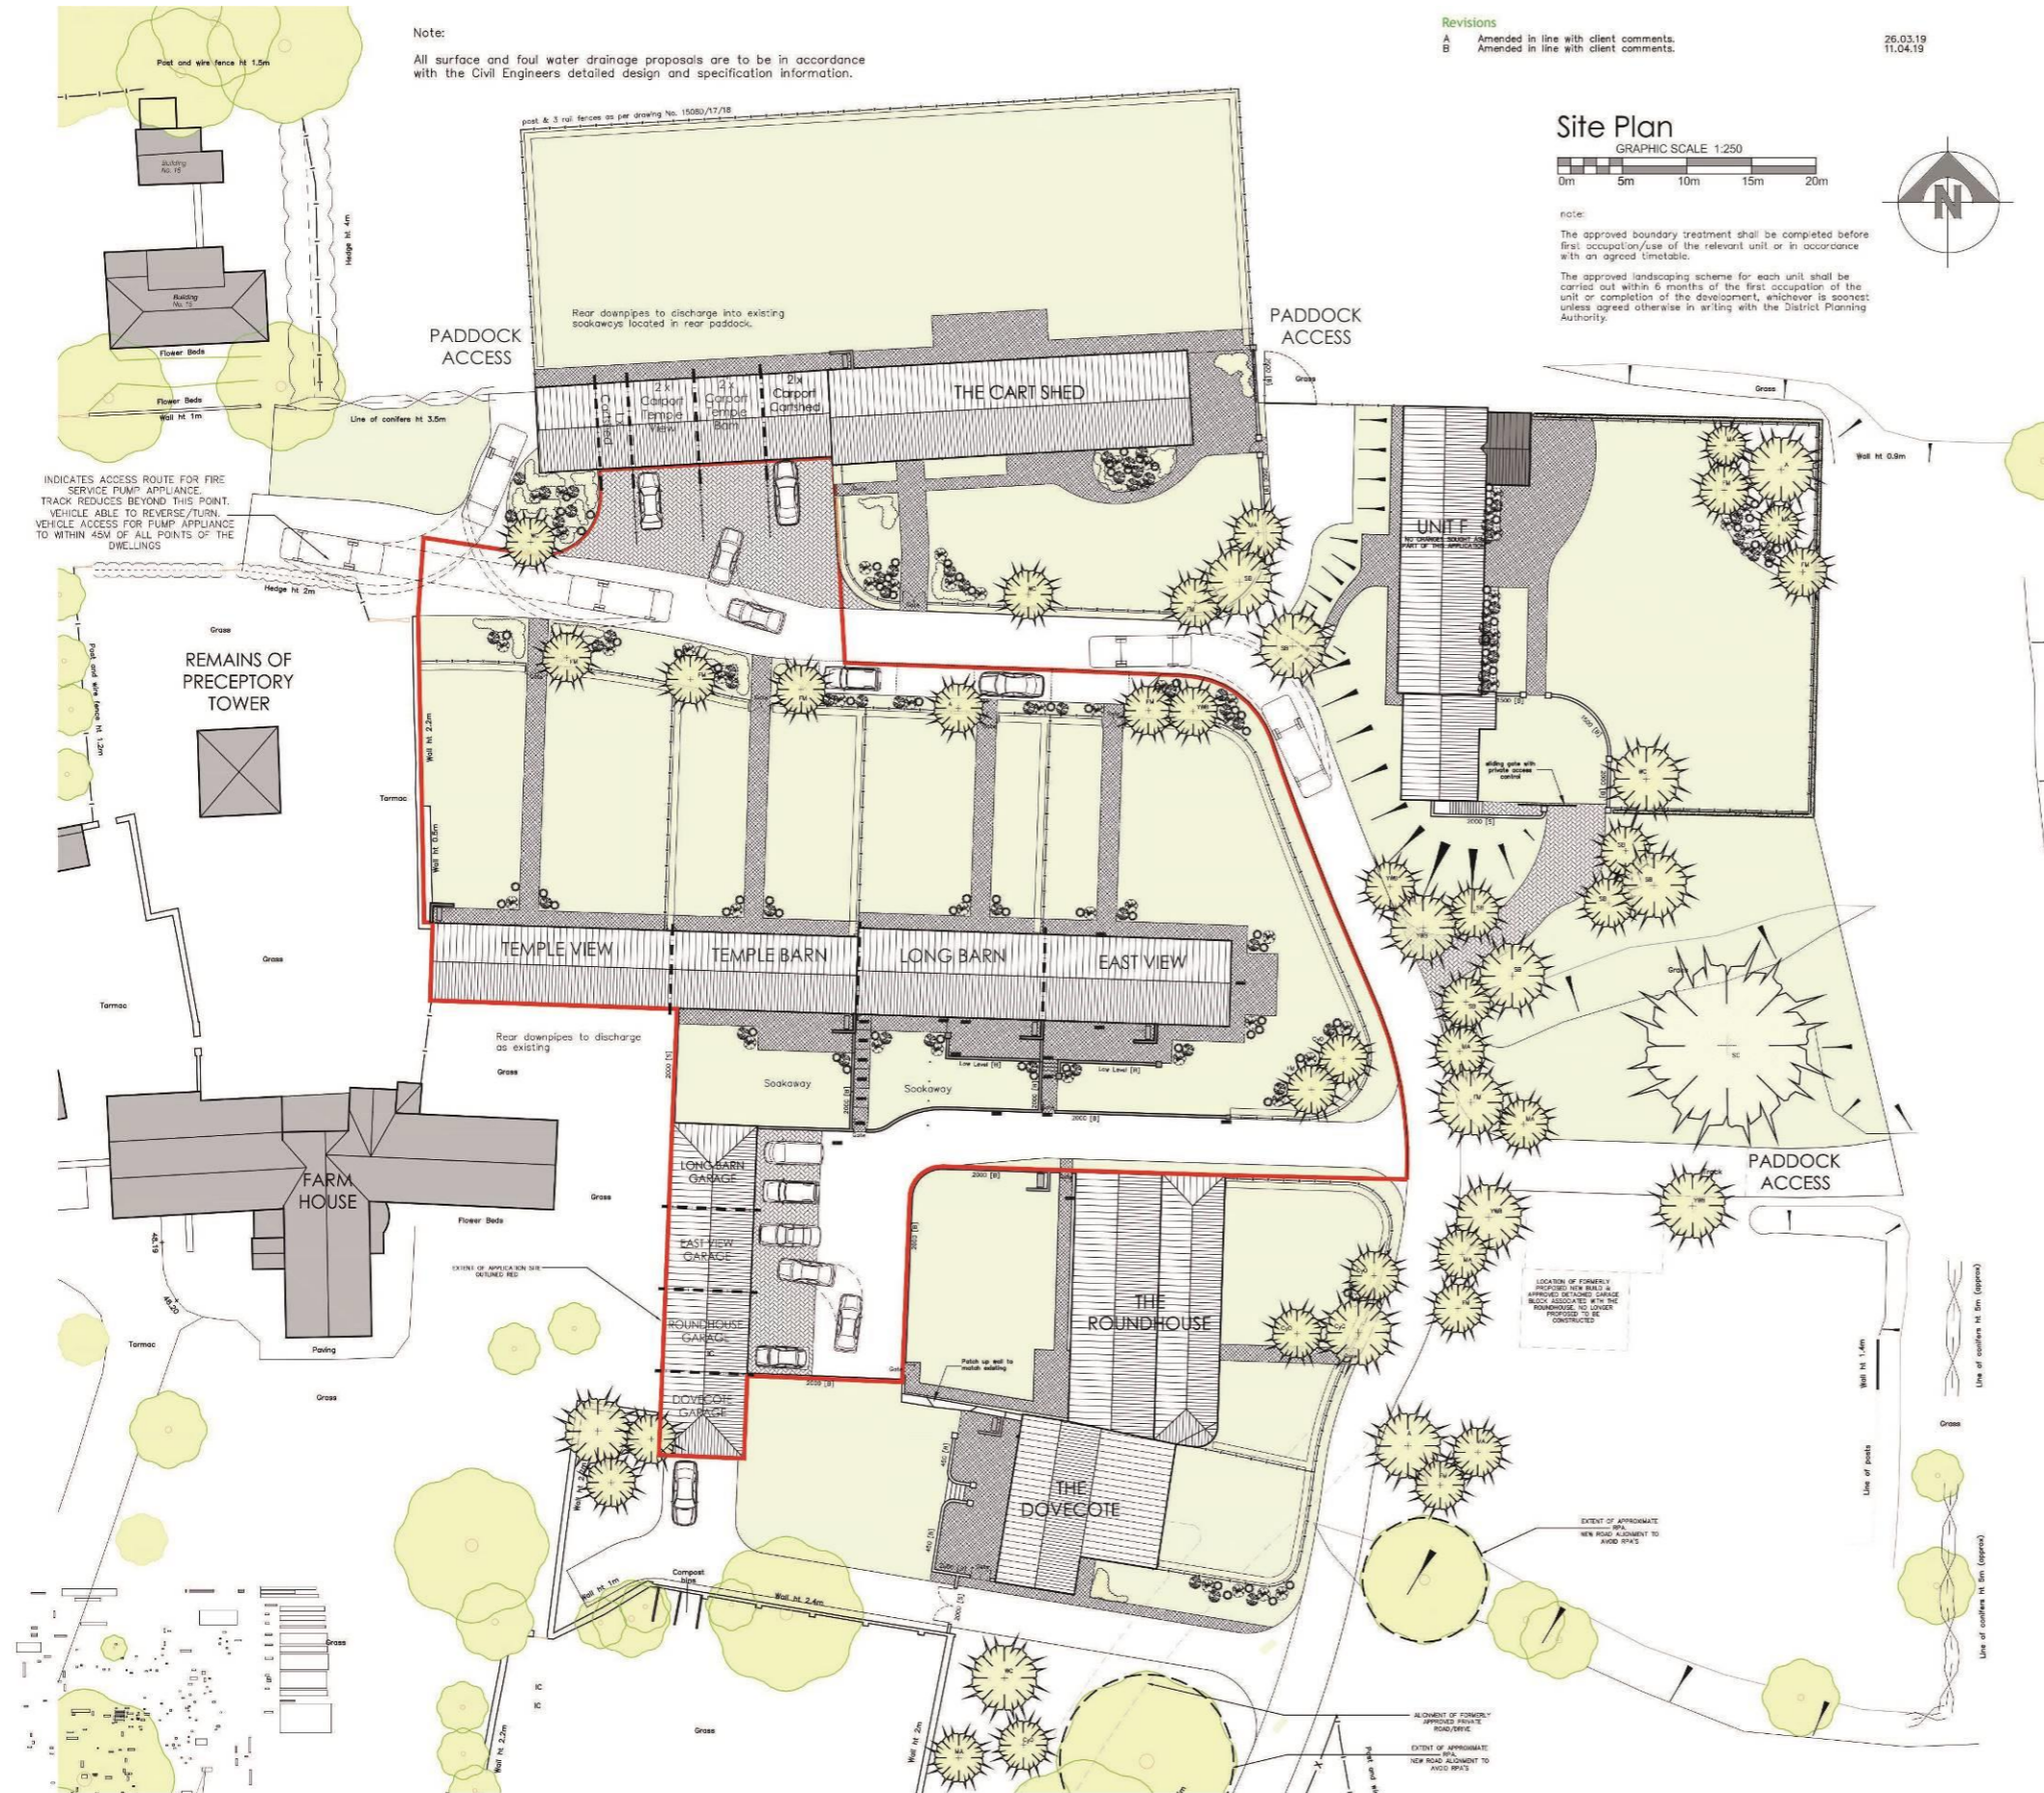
Proposed Layout of site. Provided by Developer. Scale 1:500 at A3.
